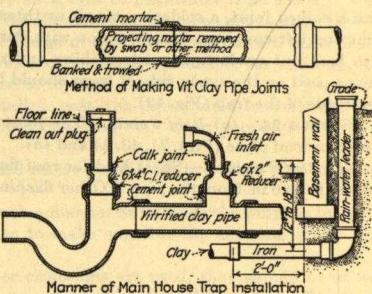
Methods in connection with the installation of vitrified clay house drains.
